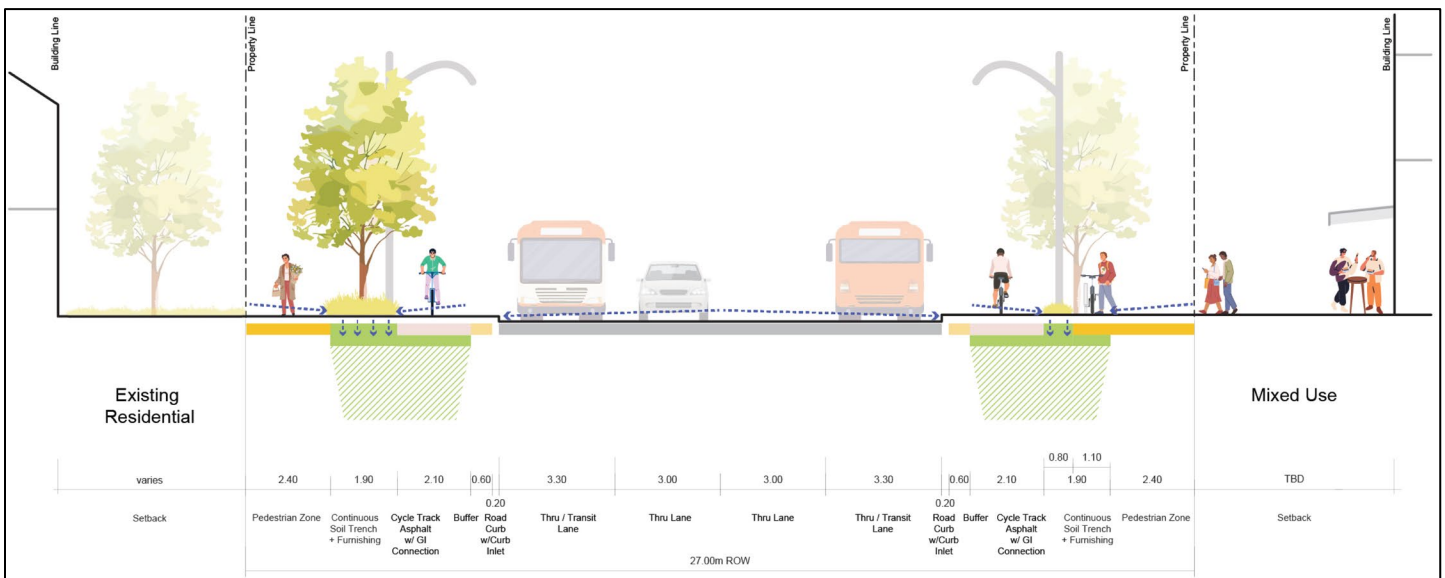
Existing Dufferin Street (Wilson Avenue to Beffort Road) Cross-Section - Option 4
